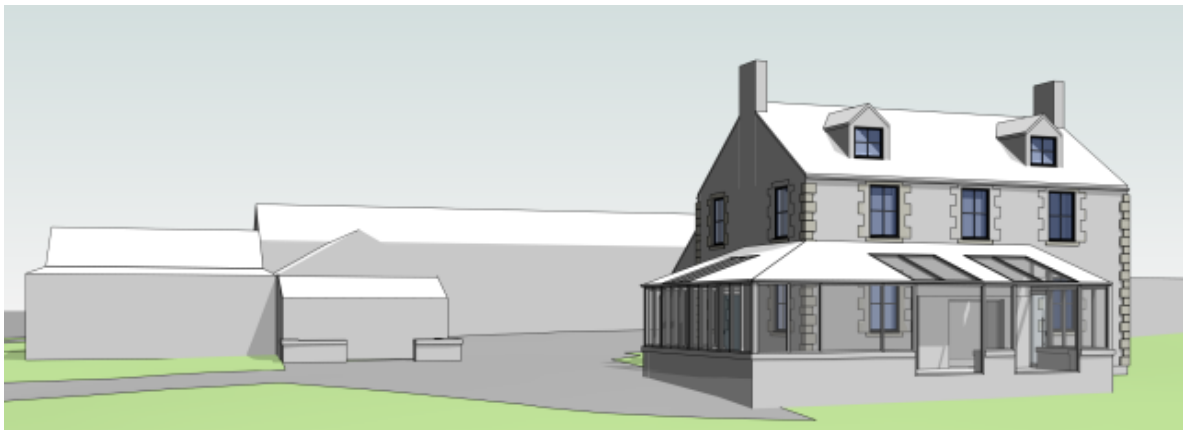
View looking north east towards the proposed glass house with the courtyard and outbuildings behind
